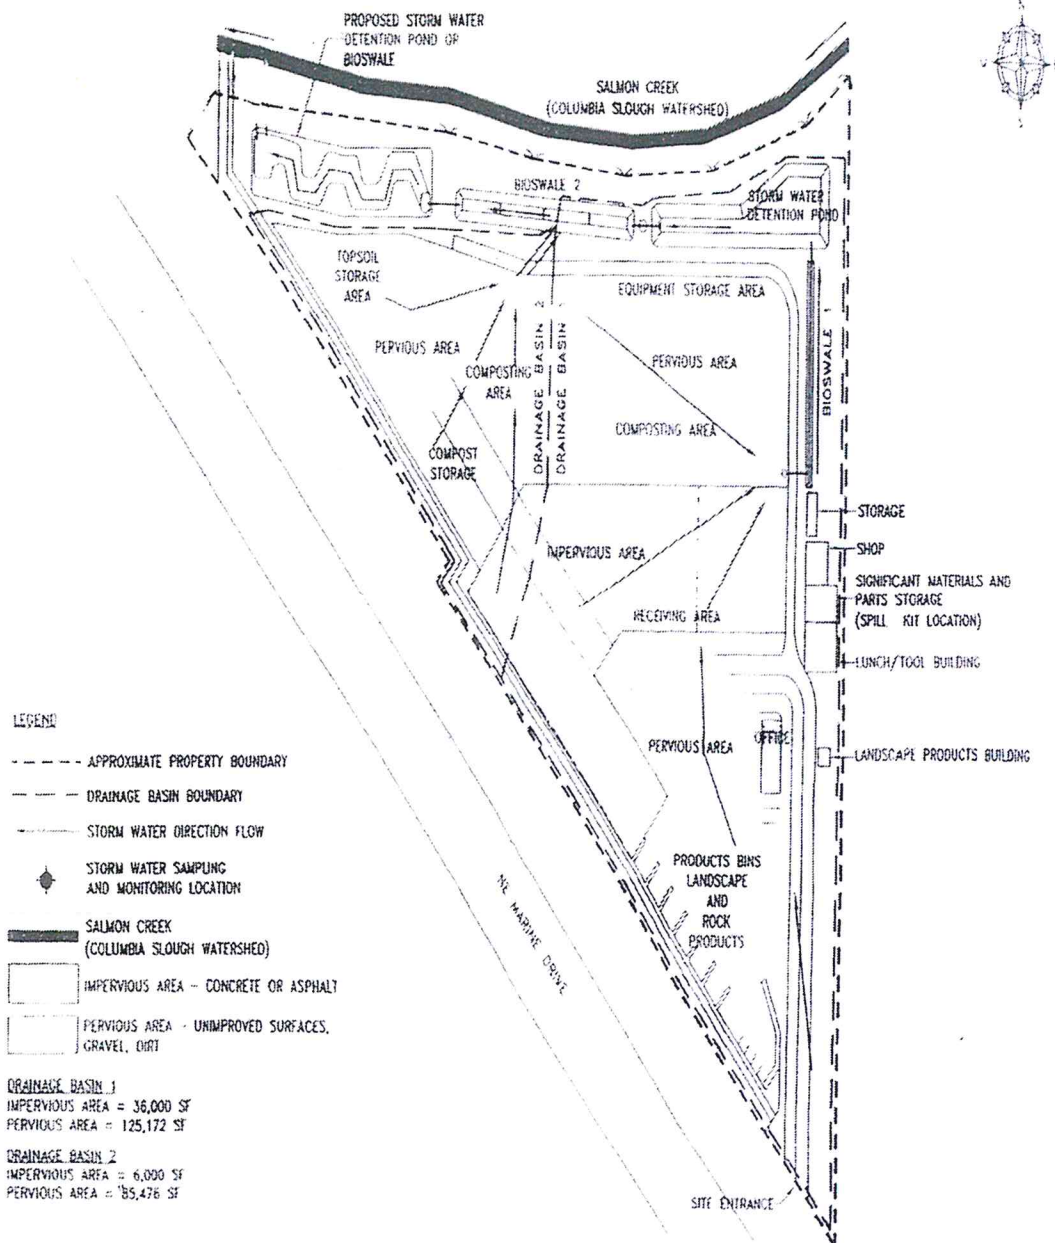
AWR Compost Yard Site Plan with Stormwater Features
